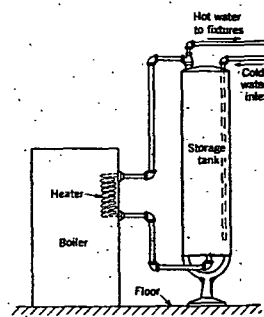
INDIRECT WATER HEATER PLACED IN BOILER
